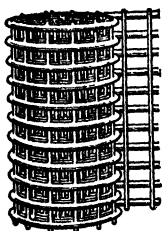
Electrically Welded Wire Fabric Reinforcement
